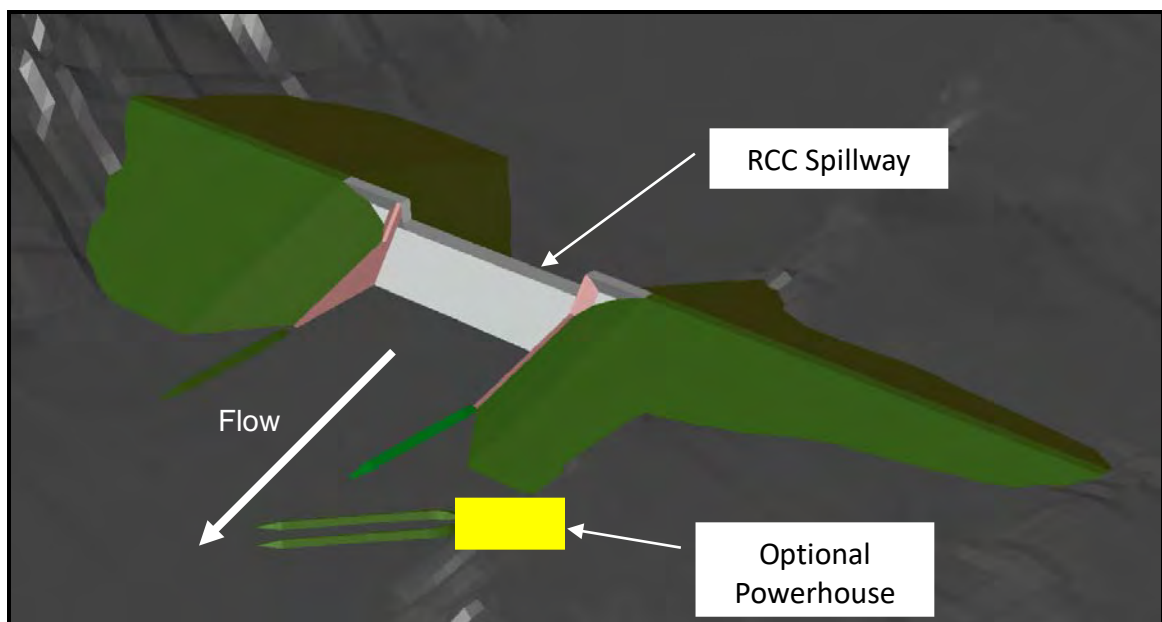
White River Dam 90,000 acre-foot Working Pool 3D Rendering
